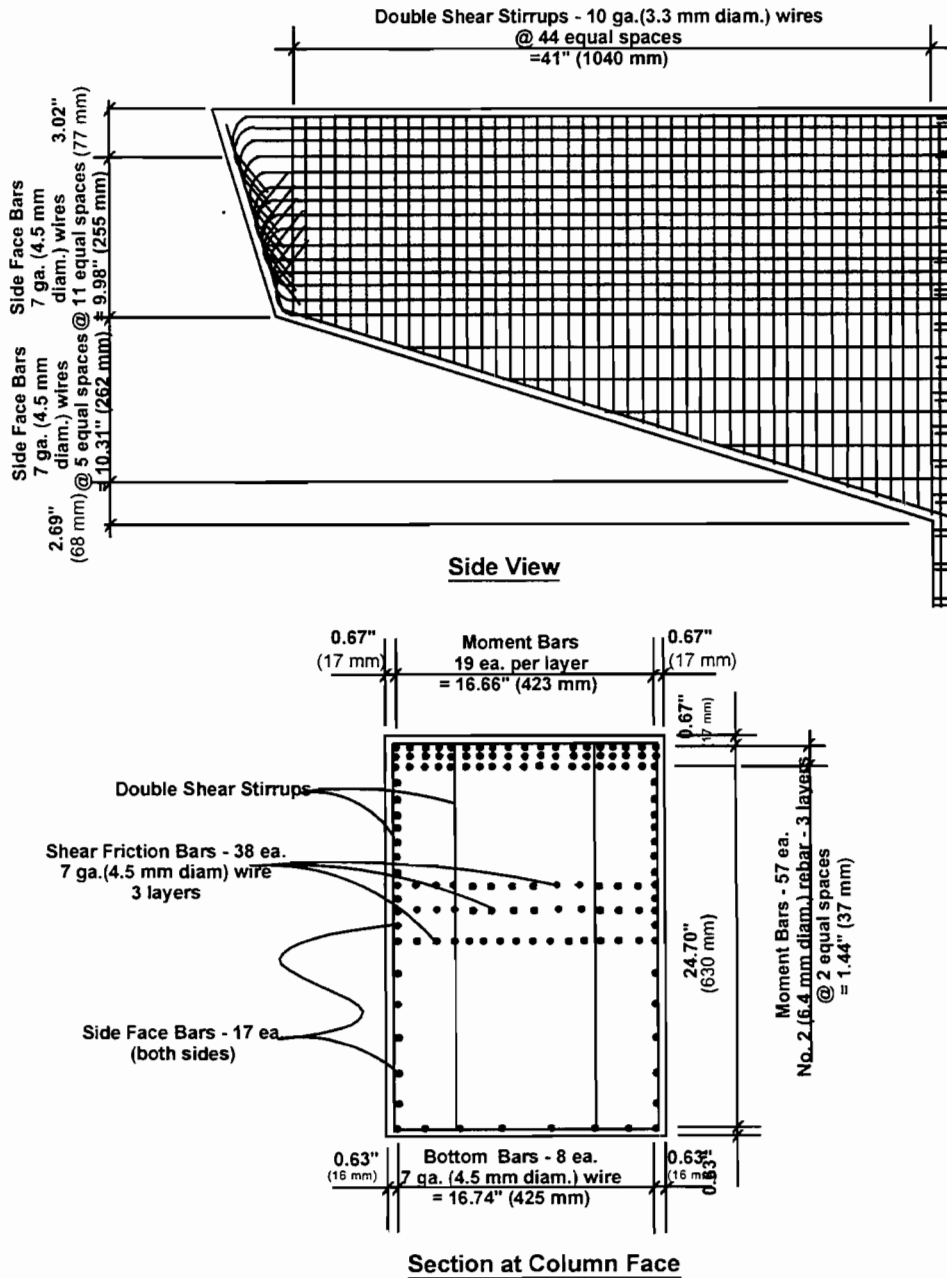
4 Reinforcing details for the CO-RU-0S-OR-N-SF overhangs
